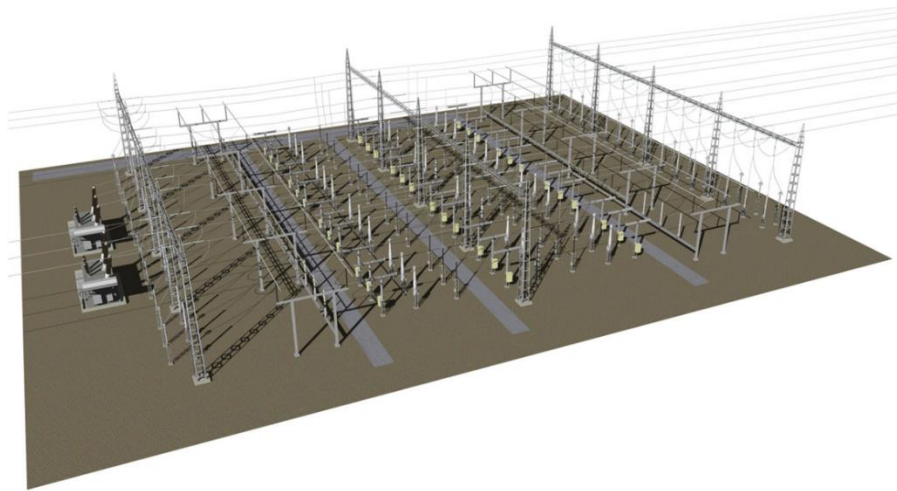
3D image of DCB solution (with 3/2 DCB)
